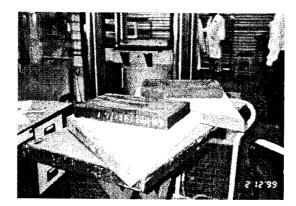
Elastomeric Bearing Pad Vulcanized With Trapezoidal Plate
